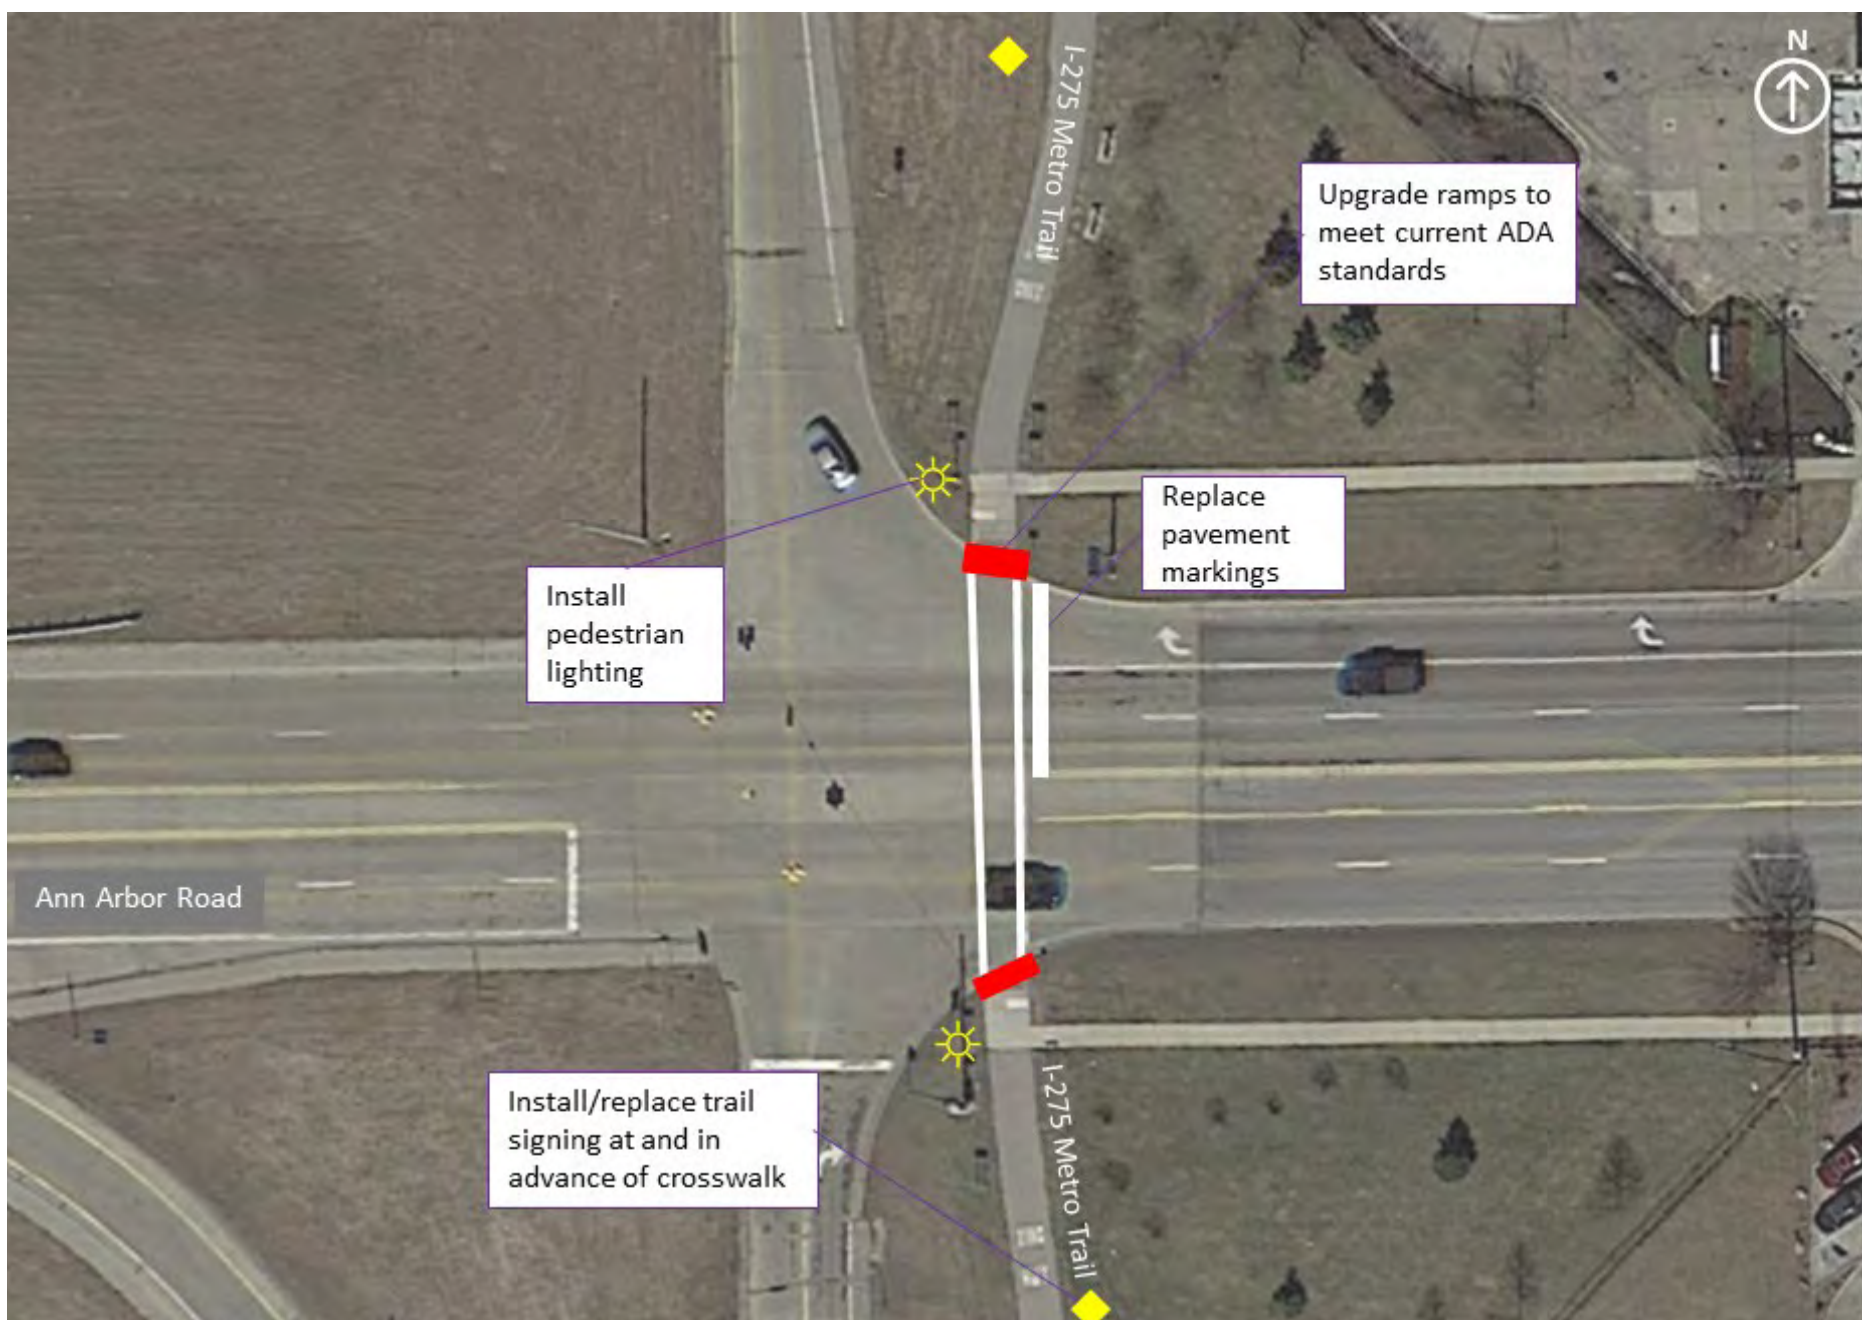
Proposed Ann Arbor Road Intersection Improvements
